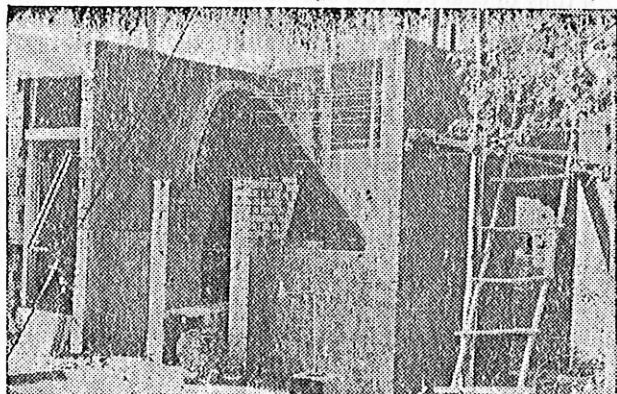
No cement, no steel (Sarvatogriha) house under construction
